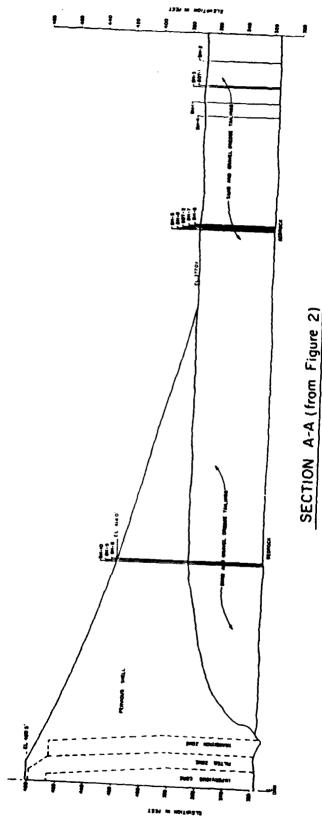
SECTION VIEW OF MORMON ISLAND AUXILIARY DAM SHOWING LOCATION OF BECKER SOUNDINGS PERFORMED IN 1983 (after U.S. Army Corps of Engineers, Sacramento District)
